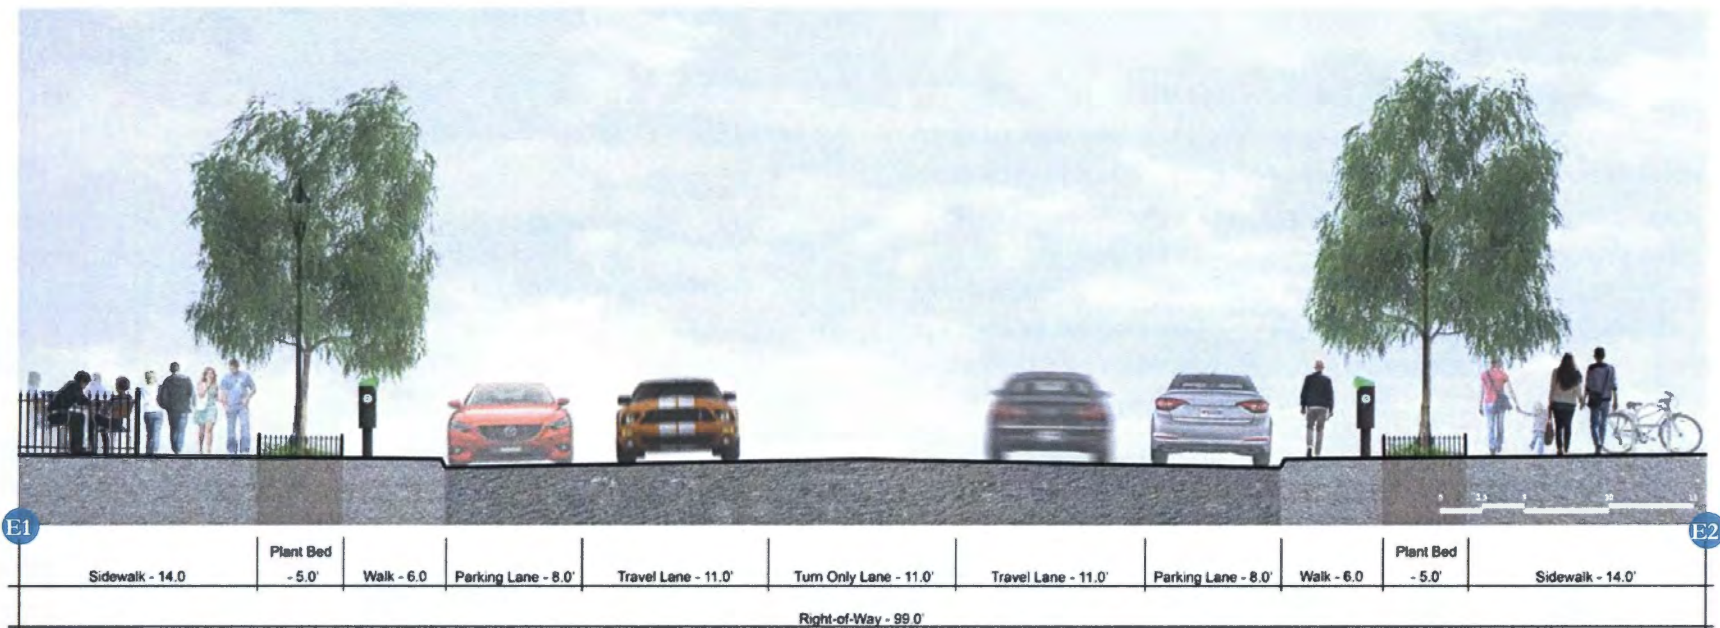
West 6th Street Between St. Clair Avenue and Johnson Court Existing Section
